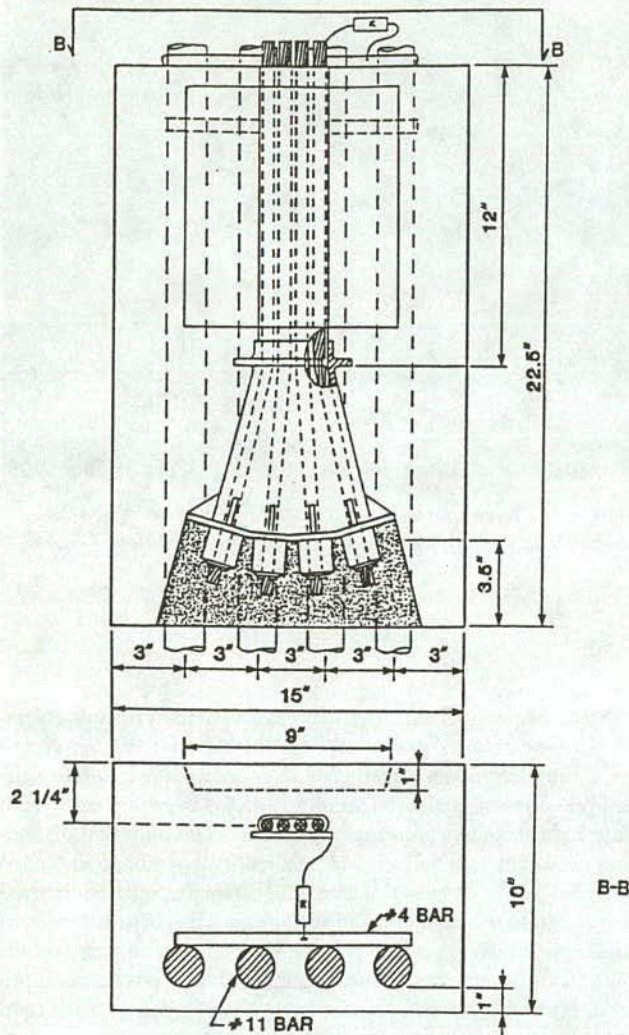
Small assembled anchorage test specimen for post-tensioned concrete corrosion study.
